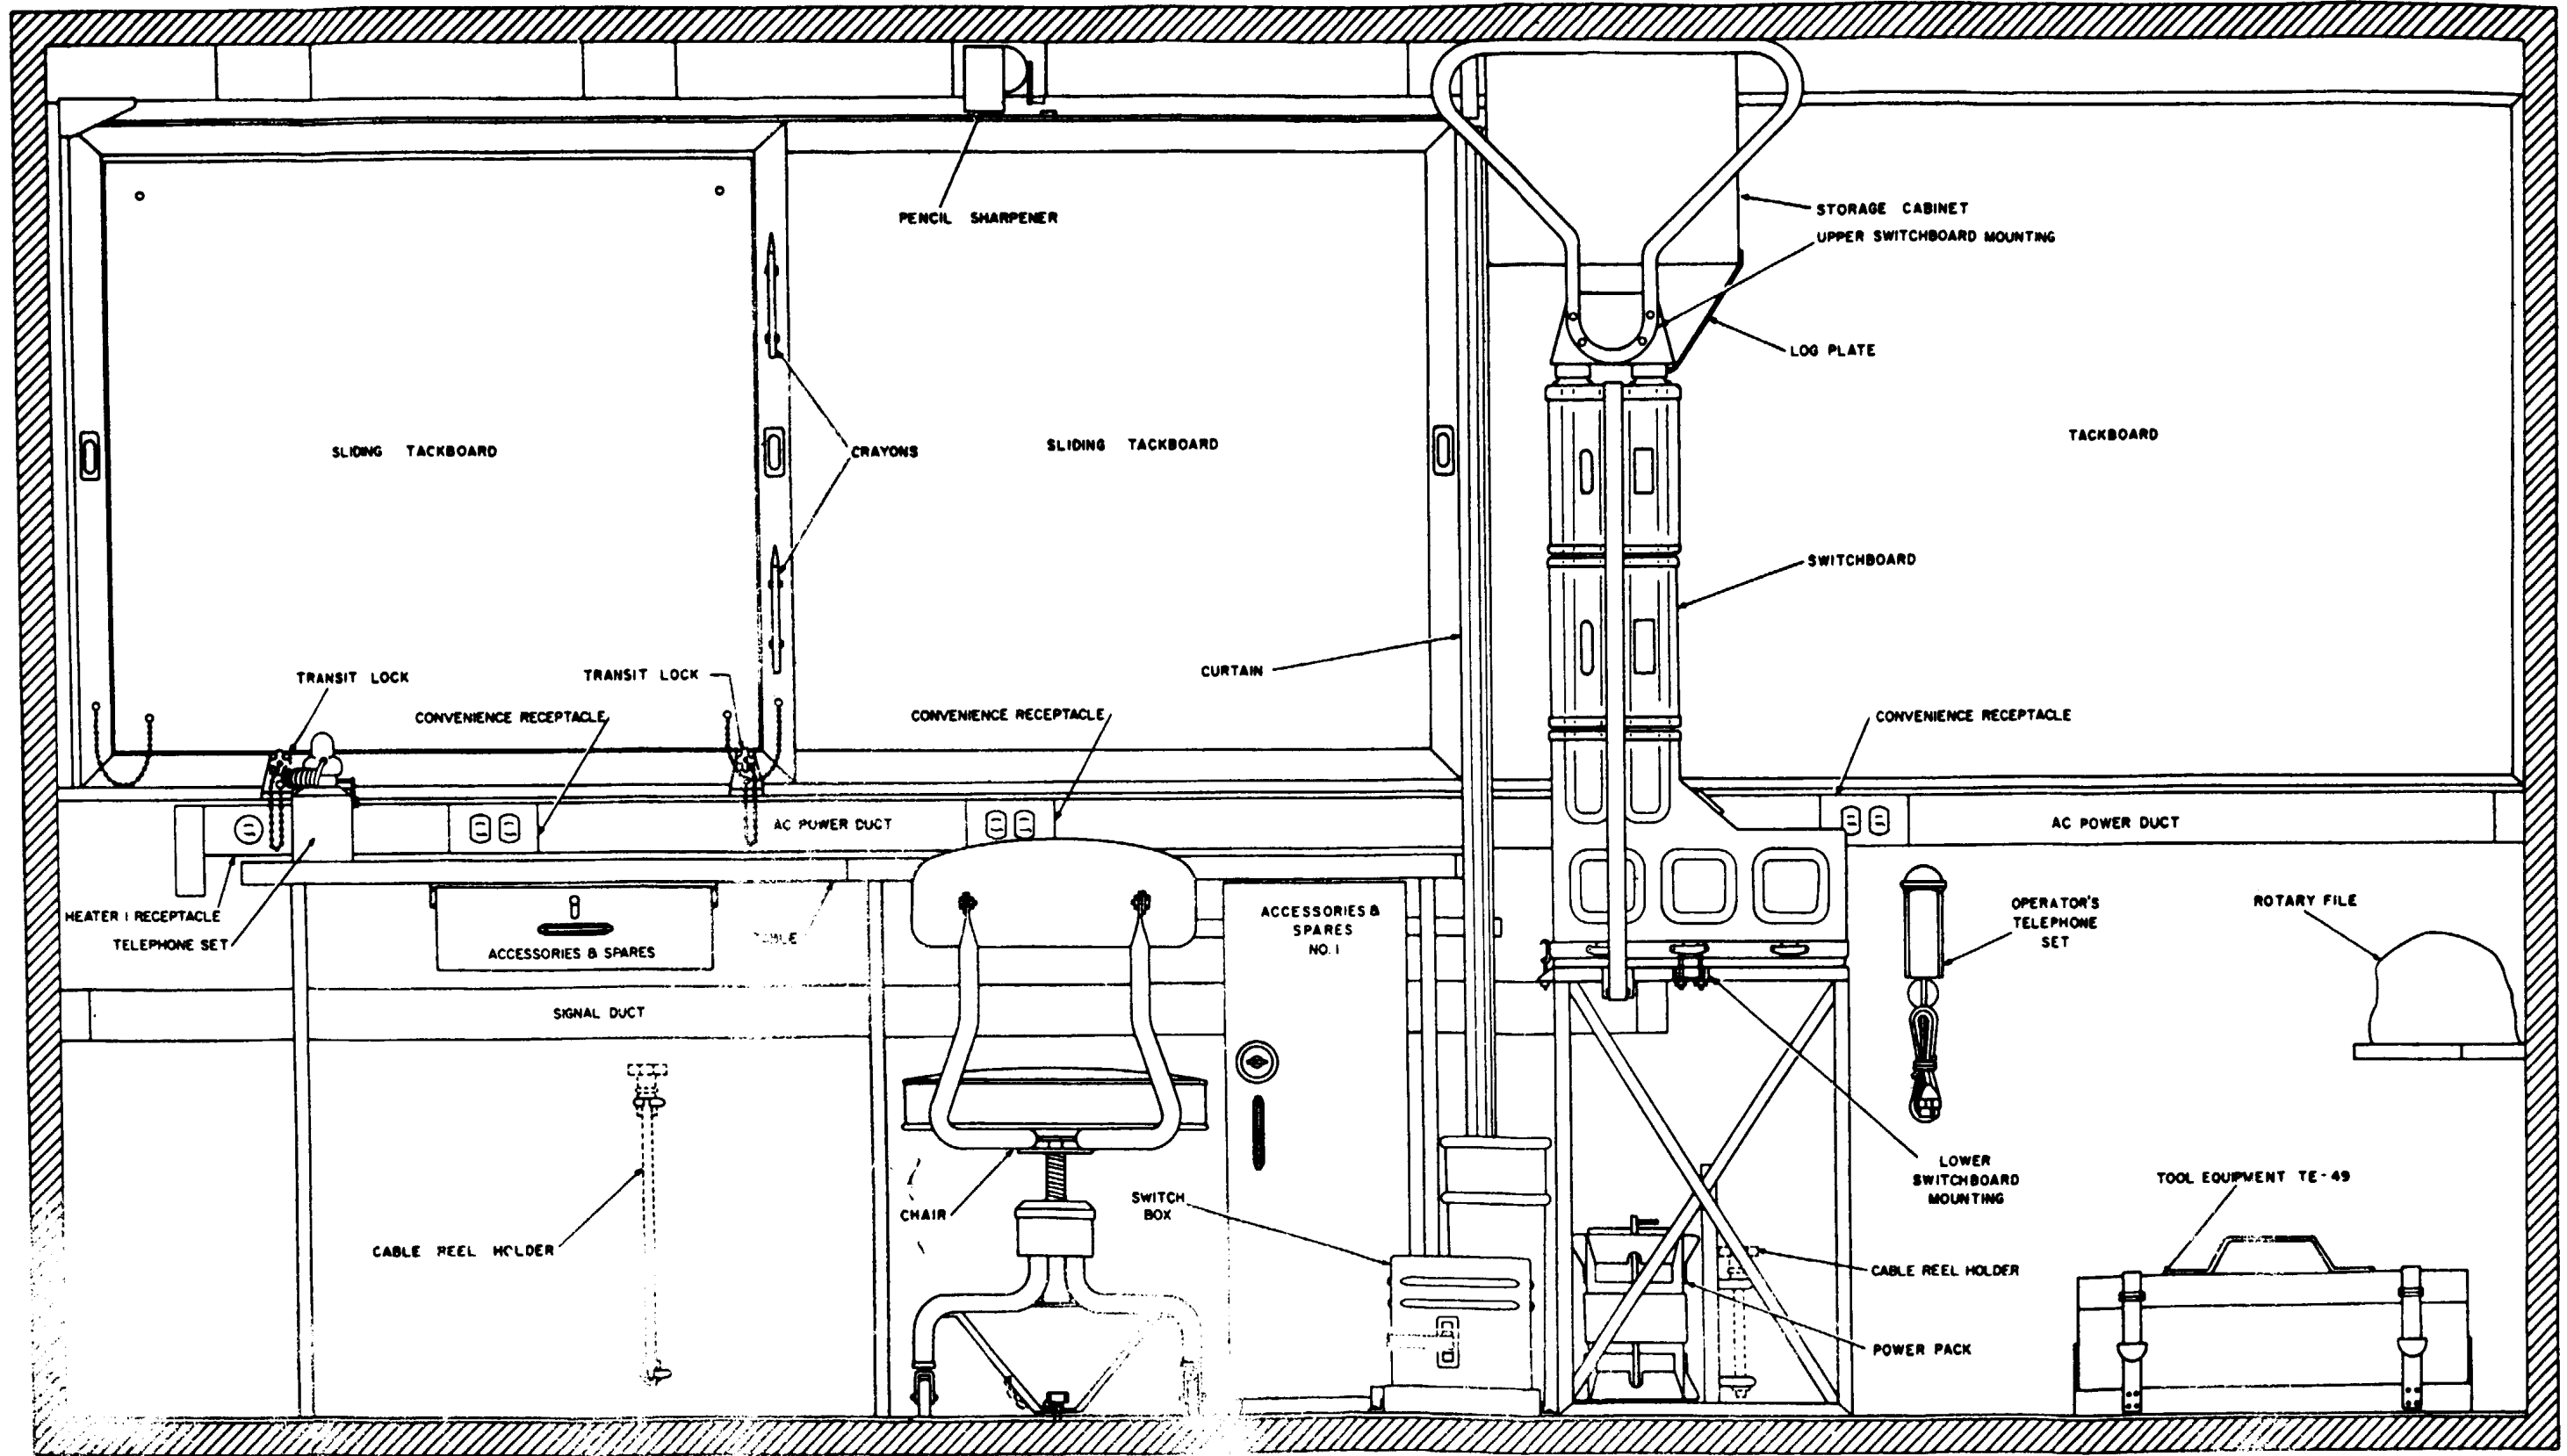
(Superseded) Shelter, elevation drawing, left wall.
